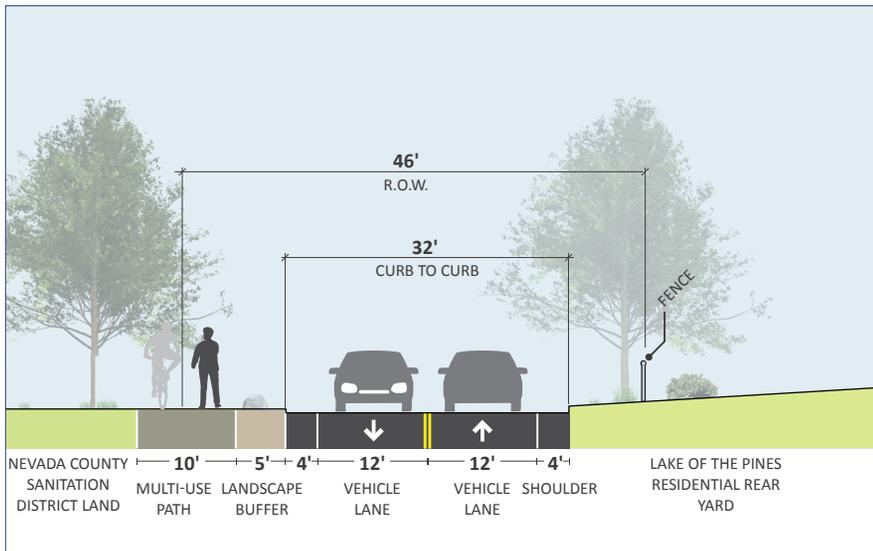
Proposed Street Section of South Combie Road at Sanitation District Land with New Multi-use Path (looking north)
